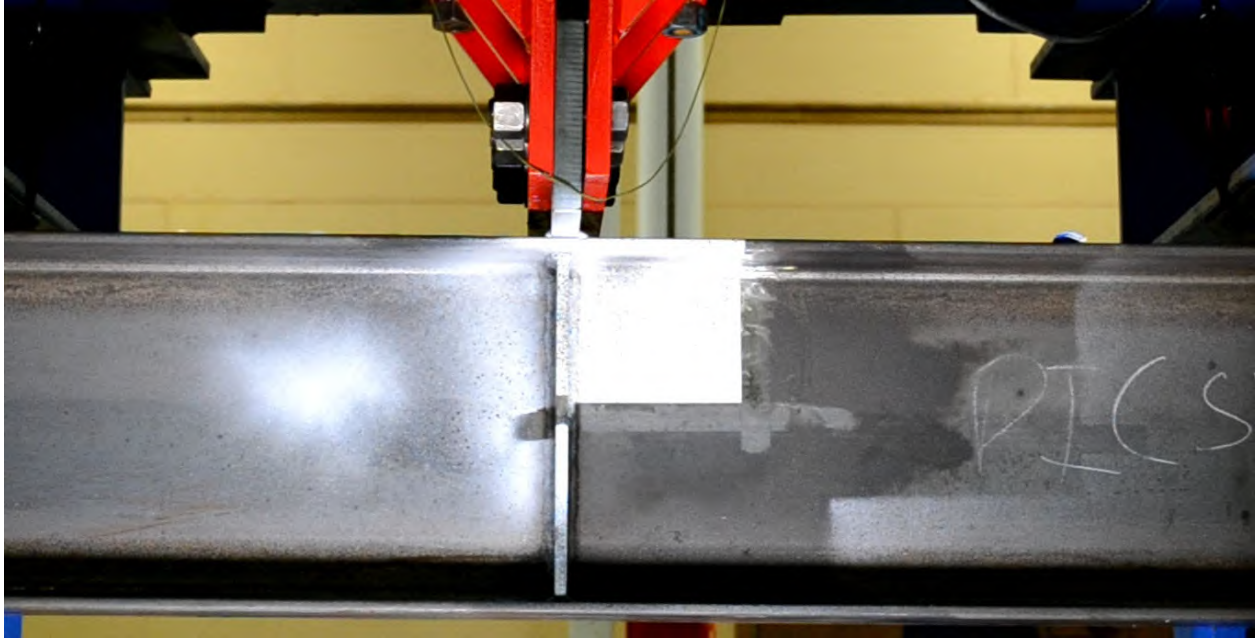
Close-up view of W12X26-ST-E2 after testing
